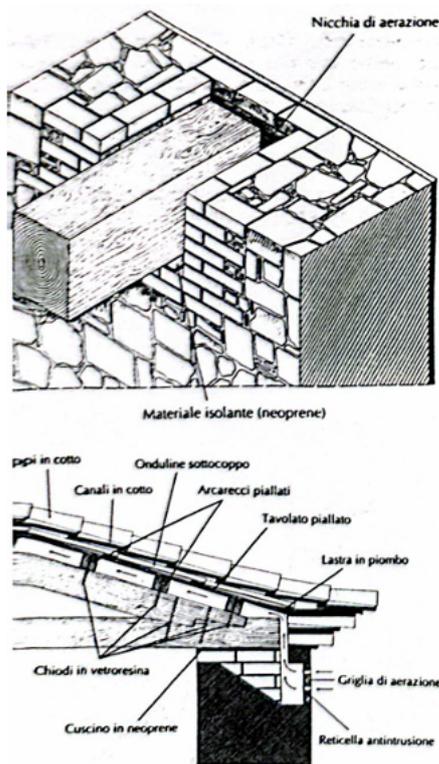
Ventilated bearing detail at the timber–masonry interface.
